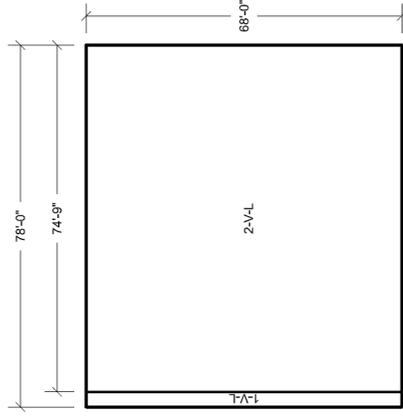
H.6-72: PUMP HOUSE INTERNAL EAST WALL LOOKING WEST
